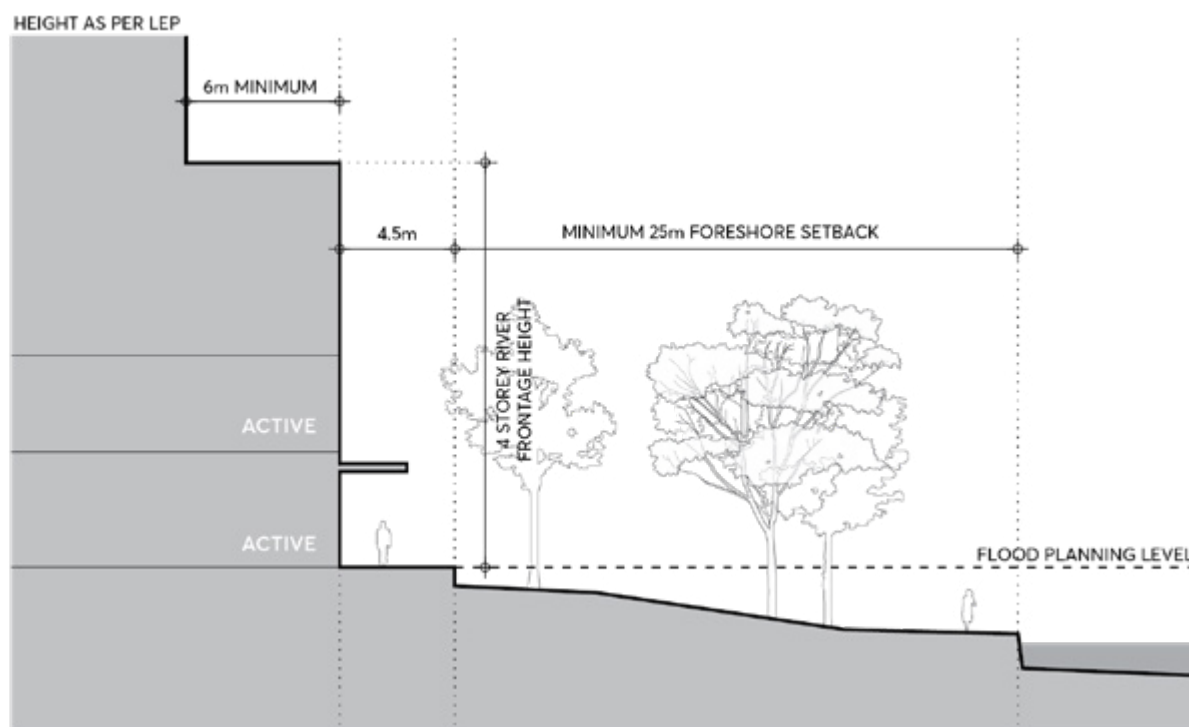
City East Block Typical River Frontage (Section A)
